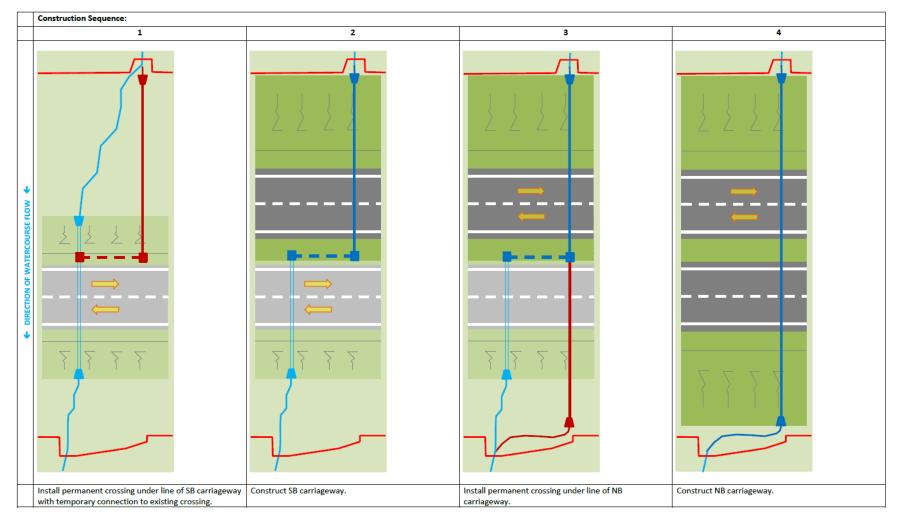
Widening to the east – road on embankment – off-line watercourse alignment
